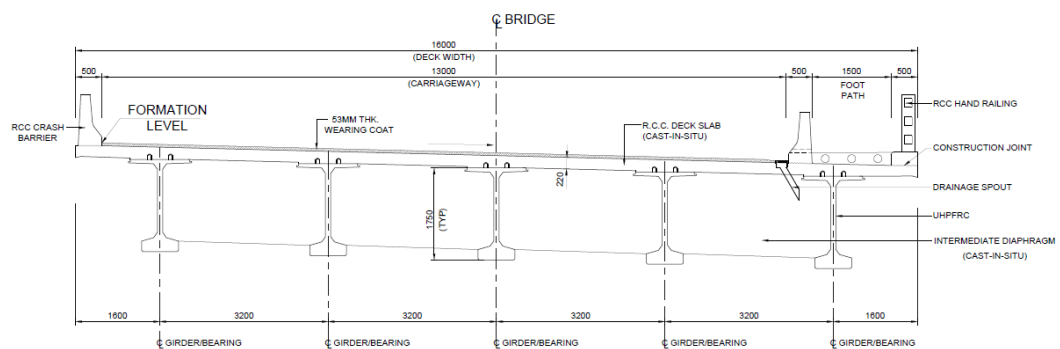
35 Cross section of 40m span UHPFRC post tensioned I girder at mid span
